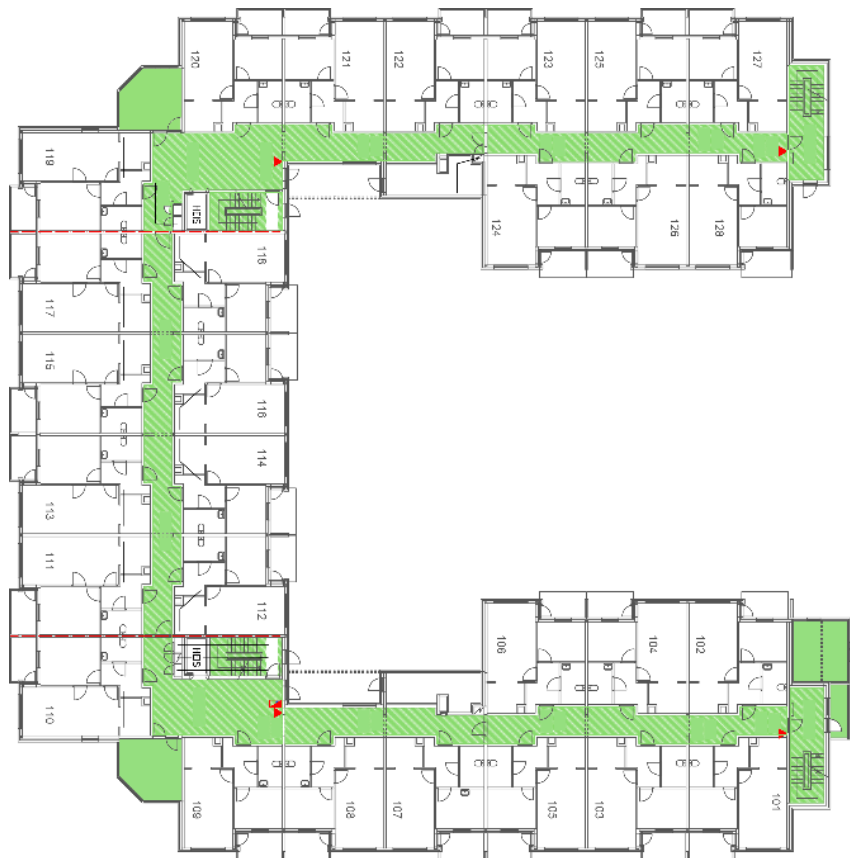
Typical Floor Plan (source: Boligstiftelsen i Trondheim)
